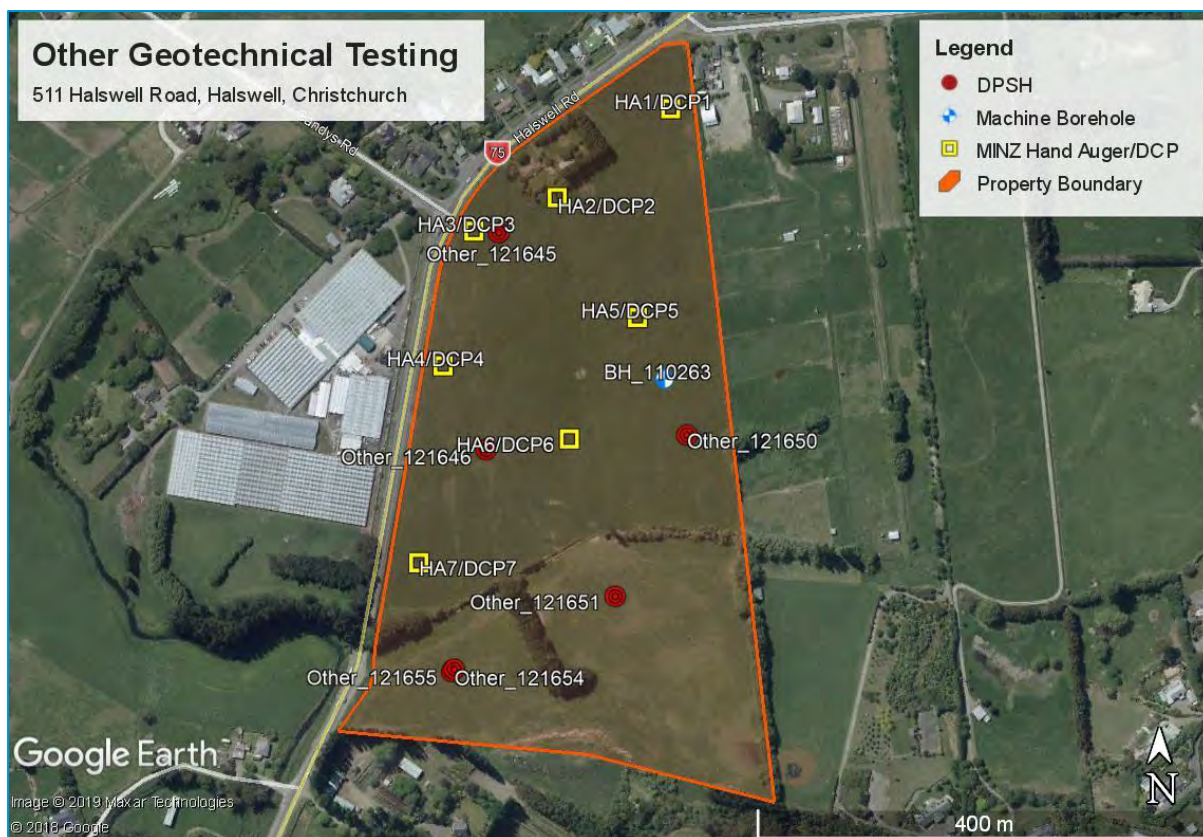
Other Geotechnical Investigation Location Plan (Scale as Shown)
